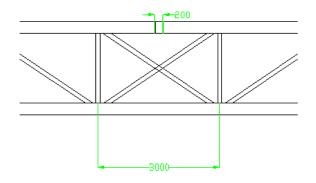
Partial front view of girder with buckling stabilisation (200 * 200 mm) welded to top flange.
